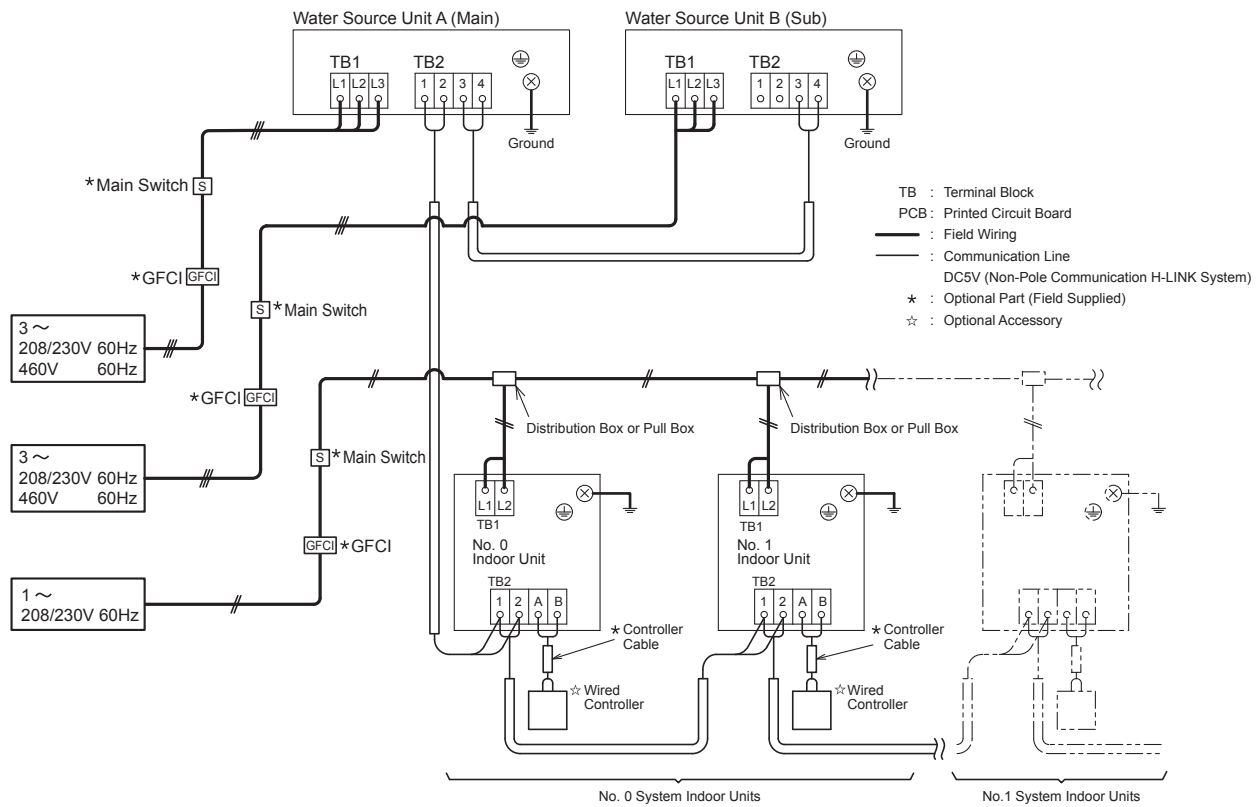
Layout for Electrical Wiring Connection (Heat Pump System)
